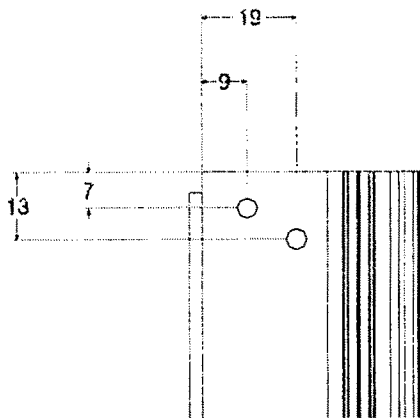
Piece fixing drawing of side finishing bar of top light("A" details)
